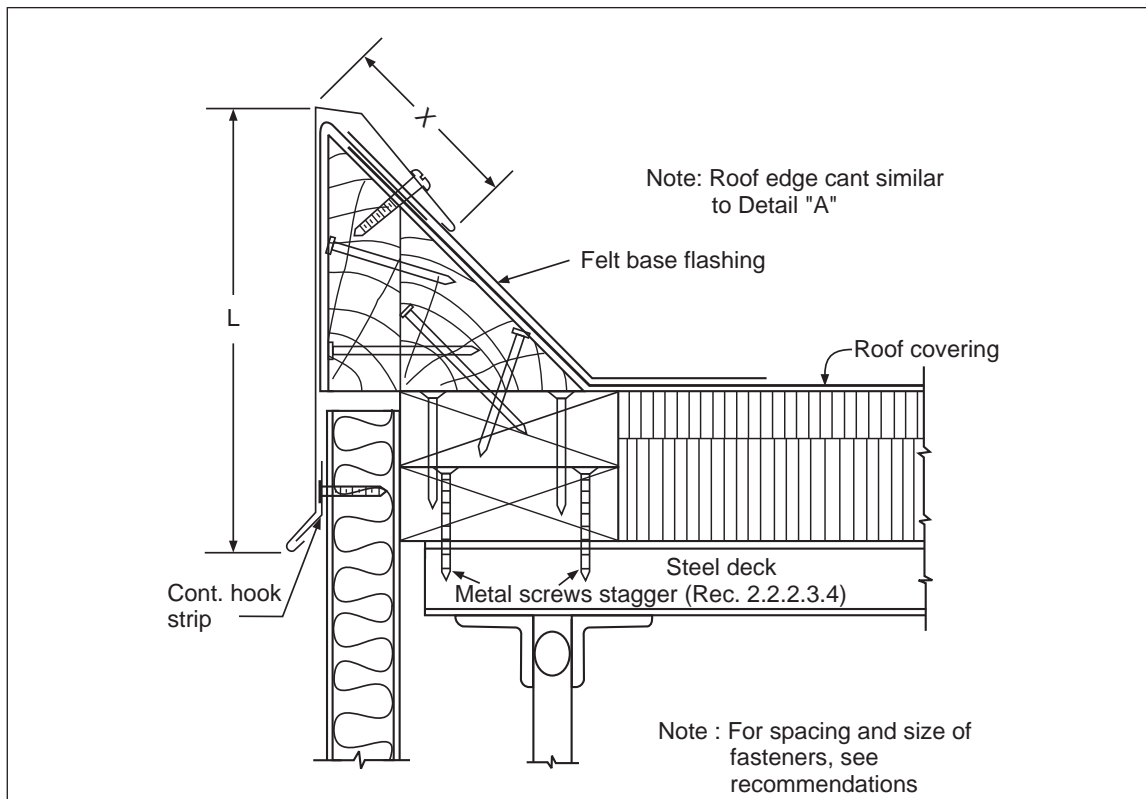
Multi-ply roof with panel wall with roof edge cant, nailer screwed to deck
